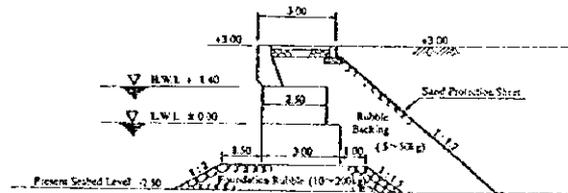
(3) Typical Cross Section of Revetment for Road (Concrete Block)
